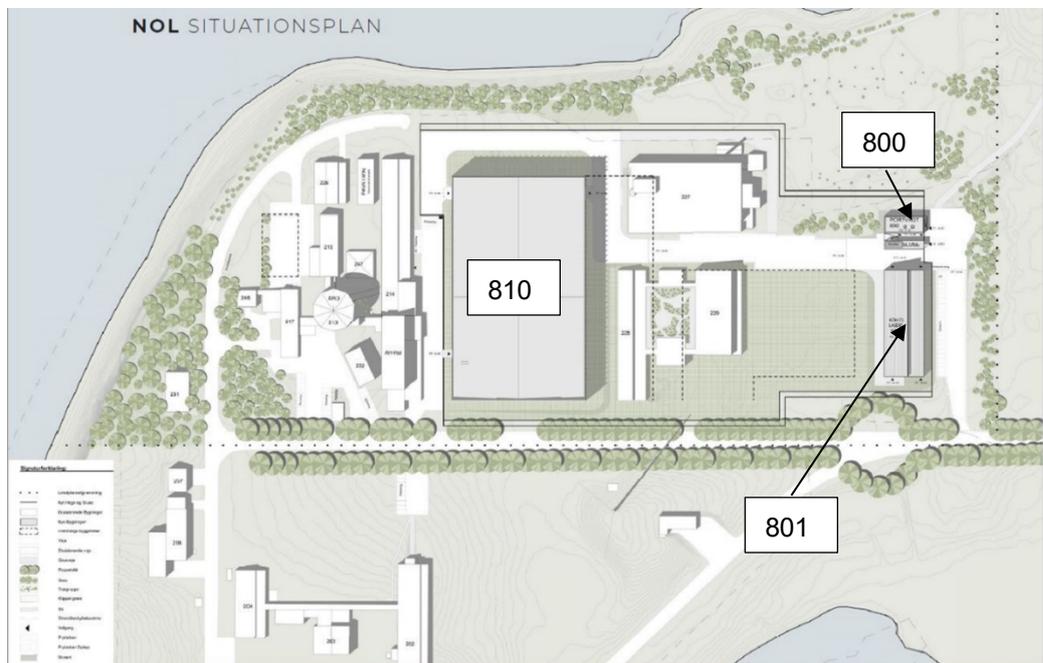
Situation plan (not to scale) of proposed new upgraded storage facilities (in grey shades) at the Risø site.
